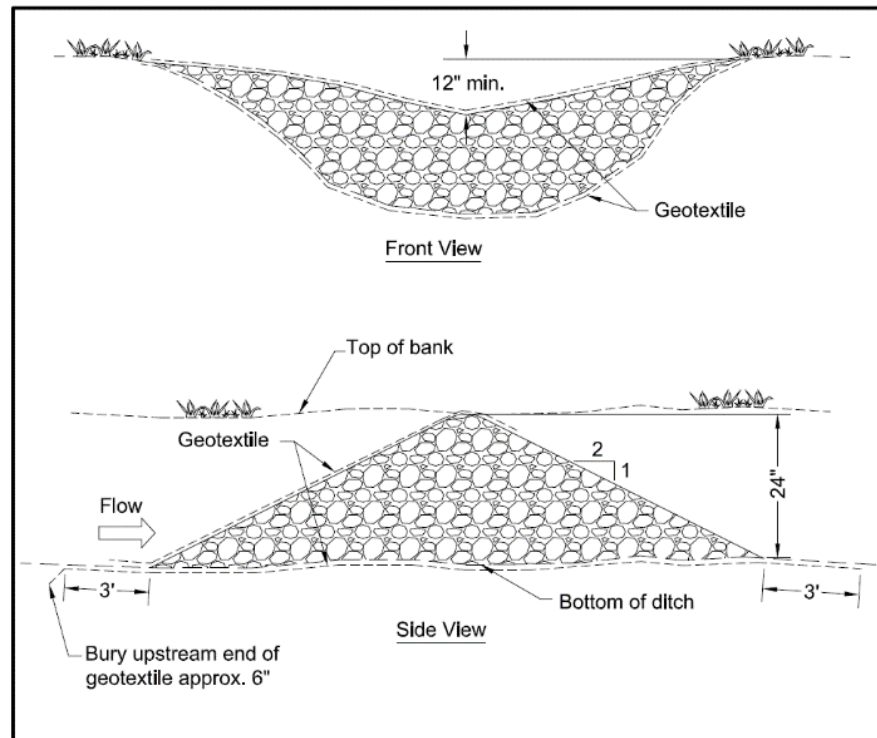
Profile and Cross-Section of Typical Rock Check Dams
